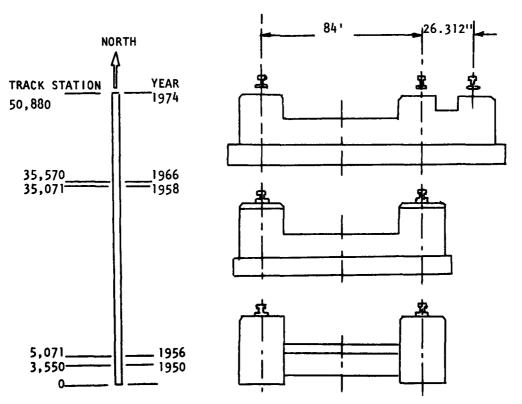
TRACK LAYOUT AND GIRDER CROSS SECTIONS
